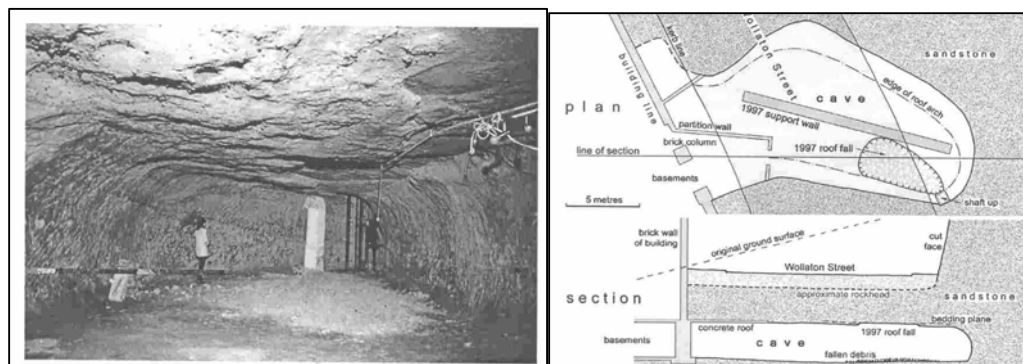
A wide cave in sandstone before a central support wall was built within it before a roof fall occurred, and the outline plan of the cave after central support wall was built (Waltham and Swift 2004).
